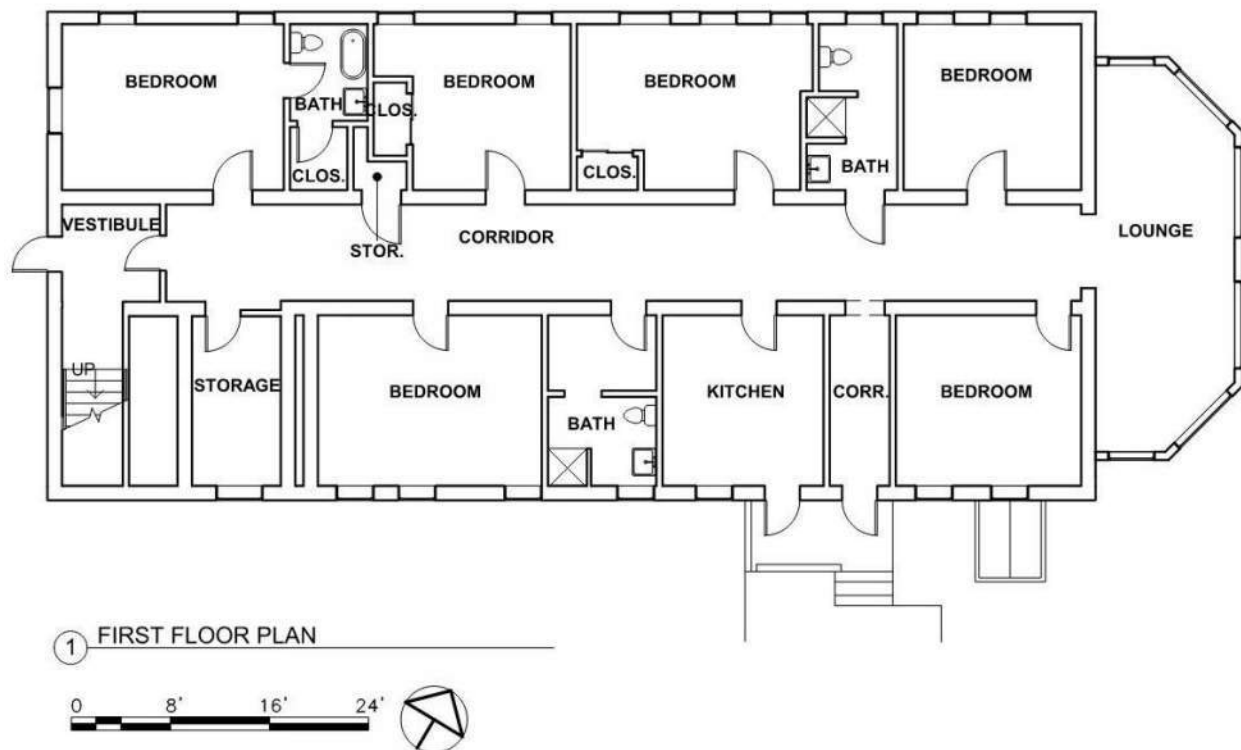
Sketch Plan of First Floor of Northern Guest House.
